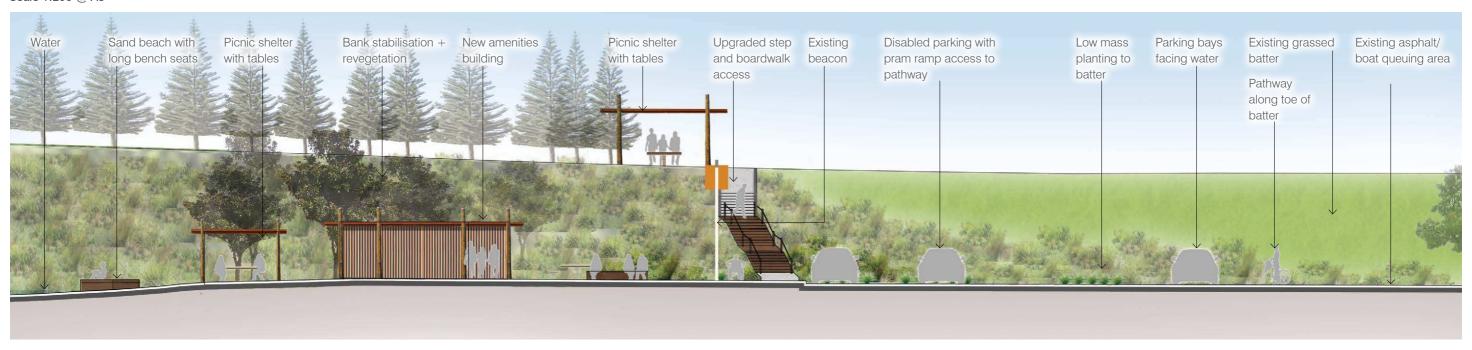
Bruce Steer Pool DRAFT Coastal Accessibility Plan
